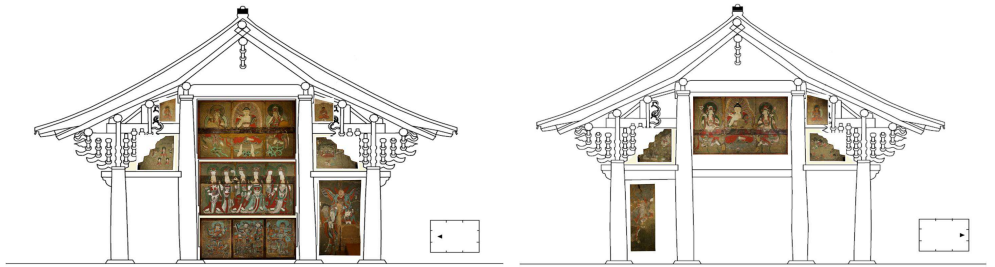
<신홍사 대광전 내벽 서벽의 벽화 배치와 공간> Arrangement of Murals on the West Wall of Taegwangjŏn Hall, Shinhŭngsa Temple, Yangsan (Photo Courtesy of the Sŏngbo munhwayusan Yŏn'guwŏn)
